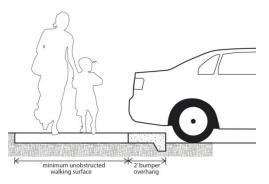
B.3. Concrete extension to accommodate bumper overhang.
